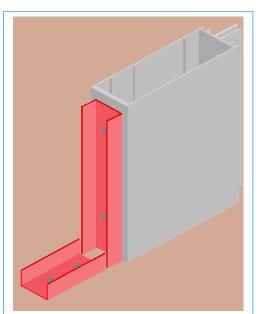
Shows metal 'C' section fixed to the floor in line with the mullion
